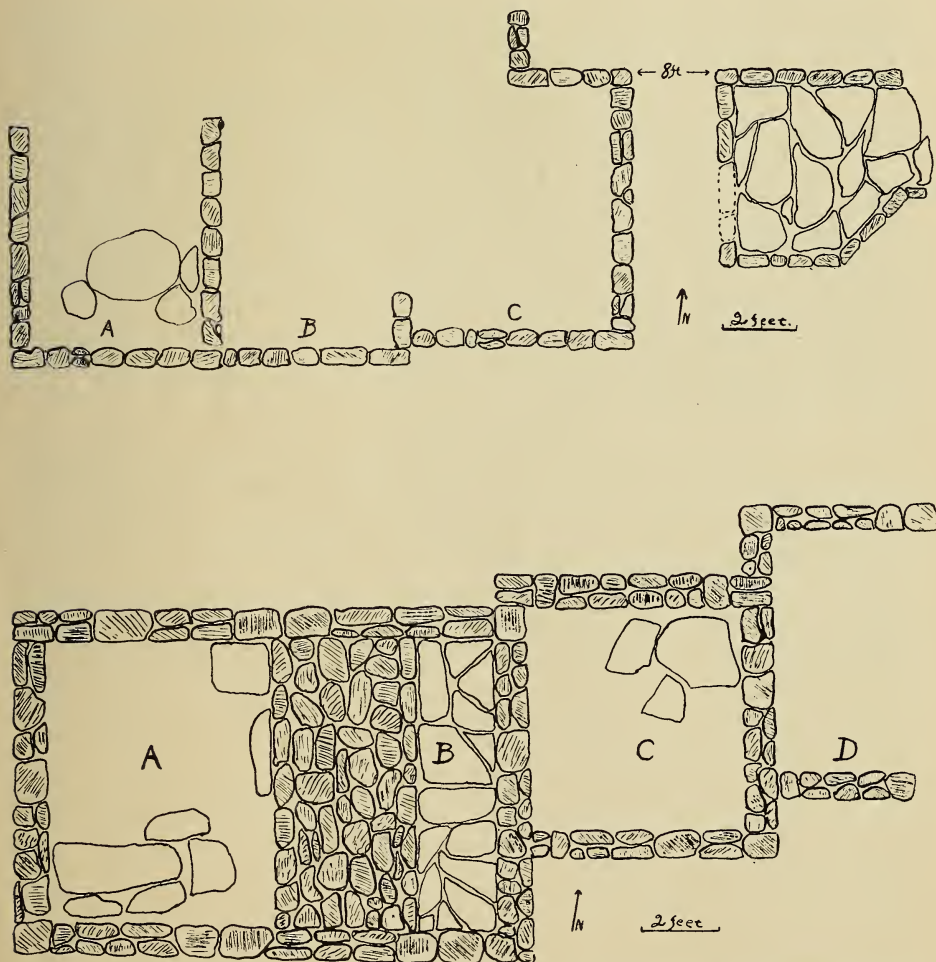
Ground Plans of Ruins Piedra No. 1 and Piedra No. 2. Upper, Piedra No. 1; Lower, Piedra No. 2.
